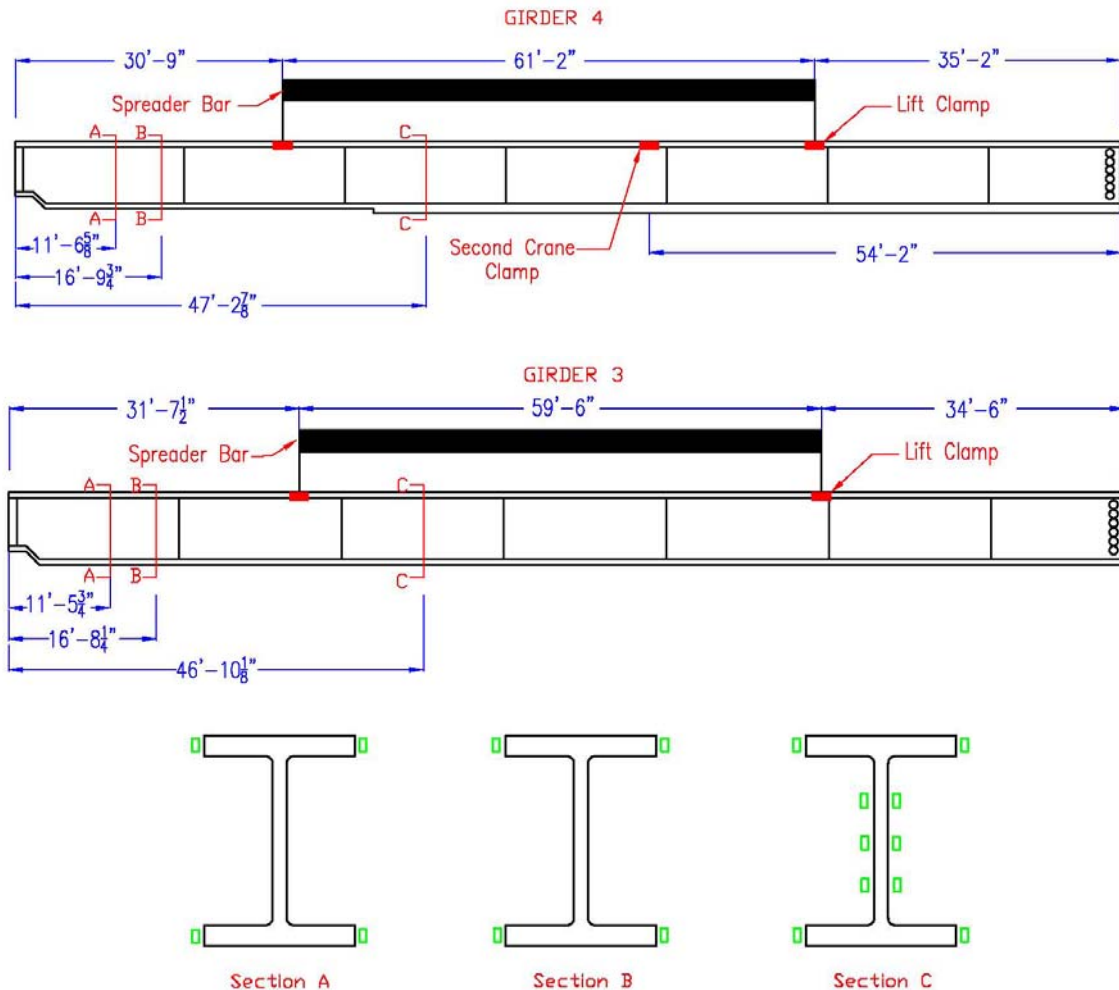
Girder 4 & 3 Plan View w/ Web Gage Locations
